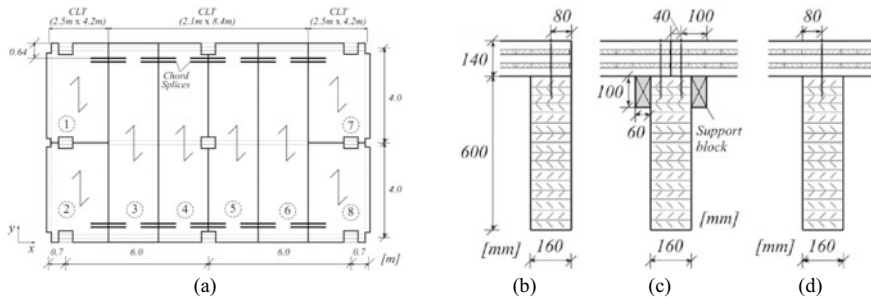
CLT diaphragm: a Plan view. b CLT-to-beam connection at diaphragm edges. c Connection of an interrupted CLT panel to a central beam. d Connection of a continuous CLT panel to a central beam
